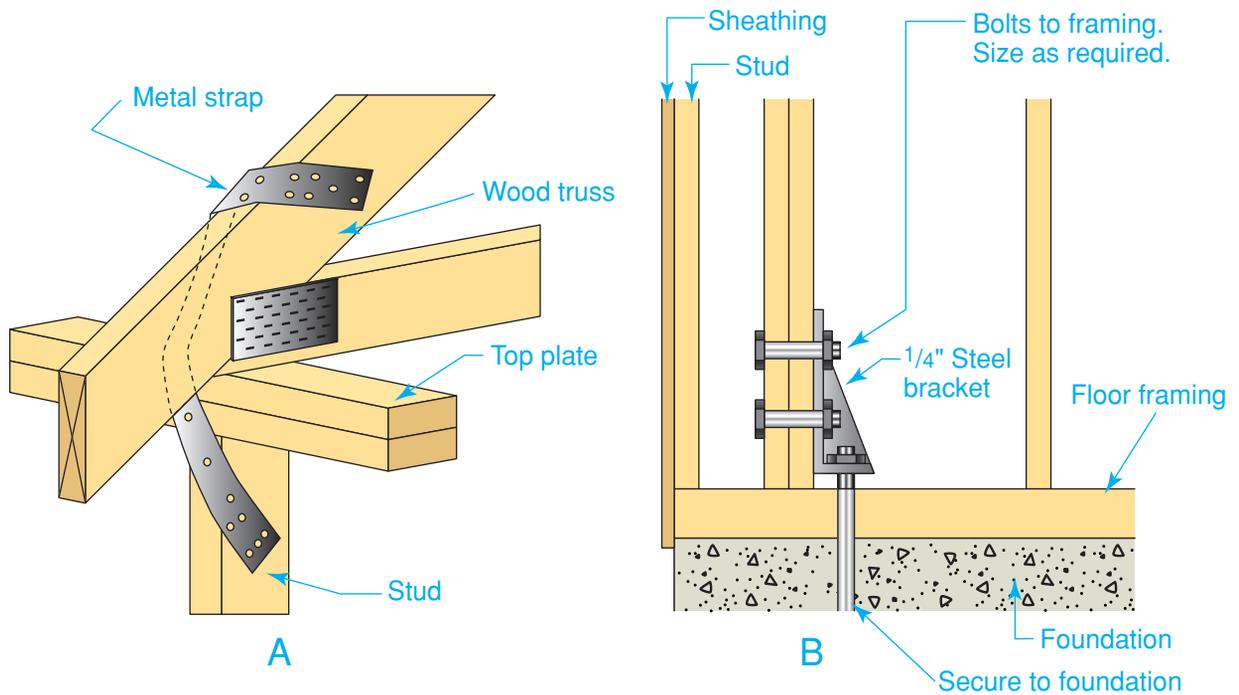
Hurricane Straps and Hold-Down Anchors
